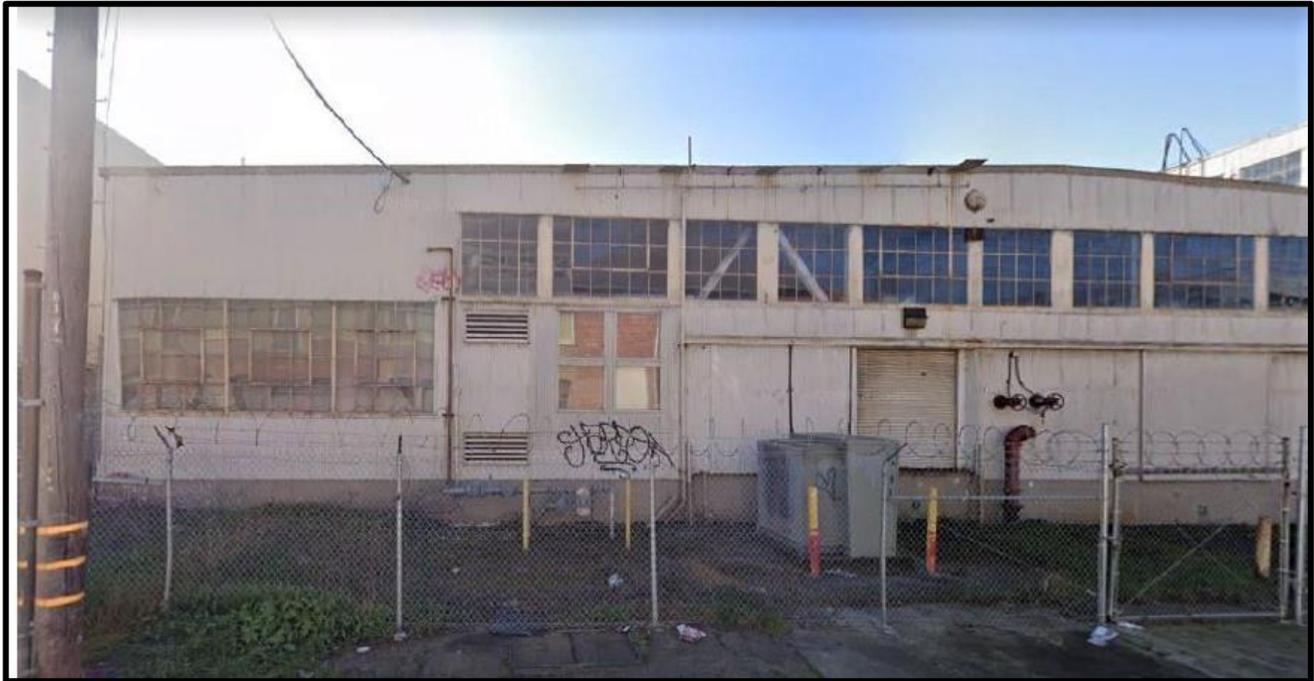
Subject Property – Central Warehouse and Factory Building, North Elevation (Historic Resource Evaluation, 2021)
